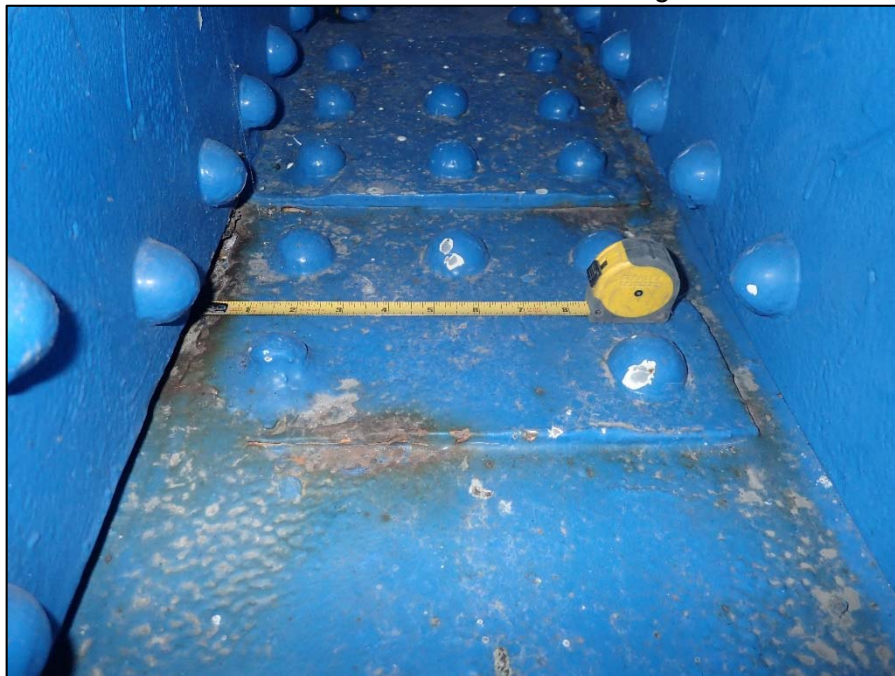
Unit III, Span 11, Panel Point L2, north truss; Painted over section loss with up to 1/2" T pack rust
